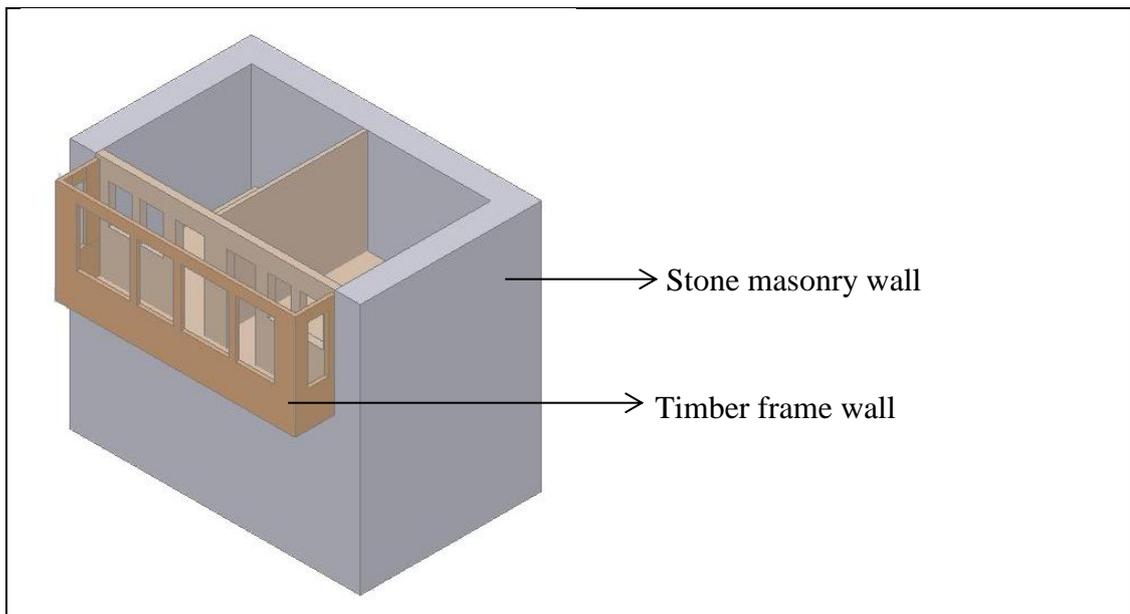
Schematic 3D drawing of construction technique of Darkale housing unit
